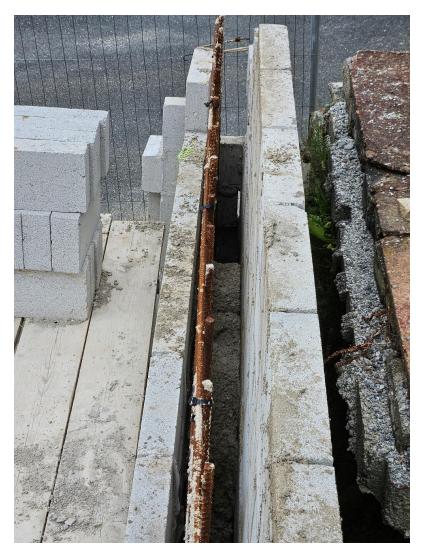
Rear retaining wall, reinforcement in incorrect position
